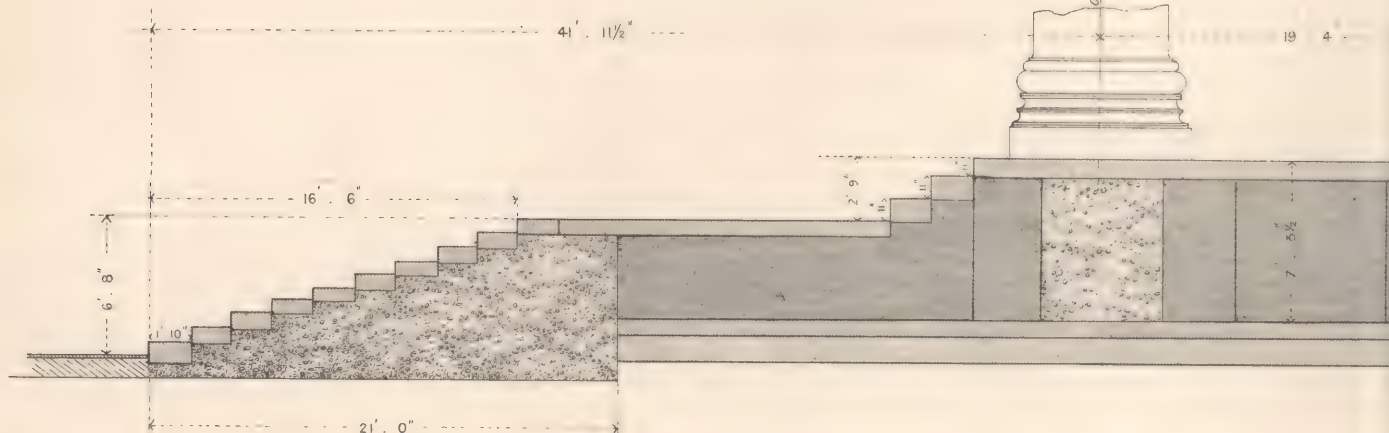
FOUNDATION OF INNER COLUMN, B PERISTYLE.
